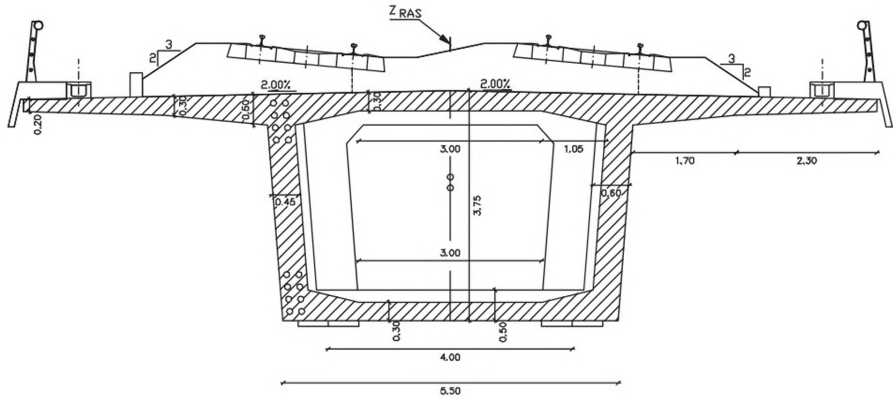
Typical cross section of a continuous railway bridge. $L_{TIP} = 50$ m.
